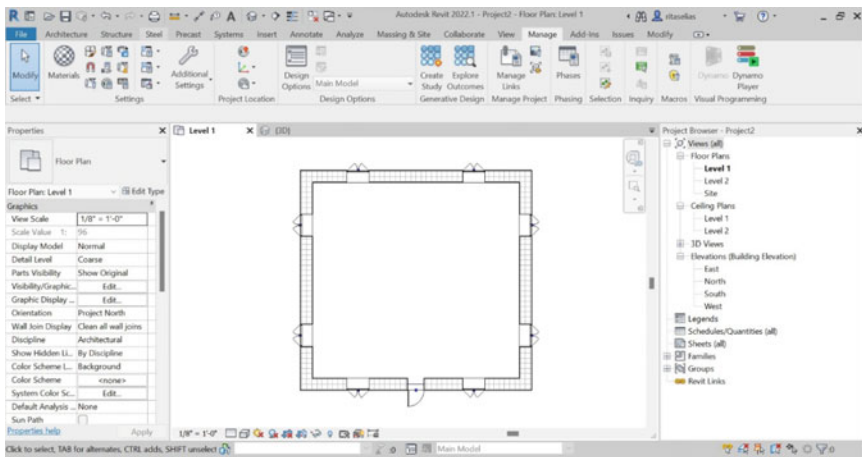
Potential House Envelope from Generative Design (Floorplan)
